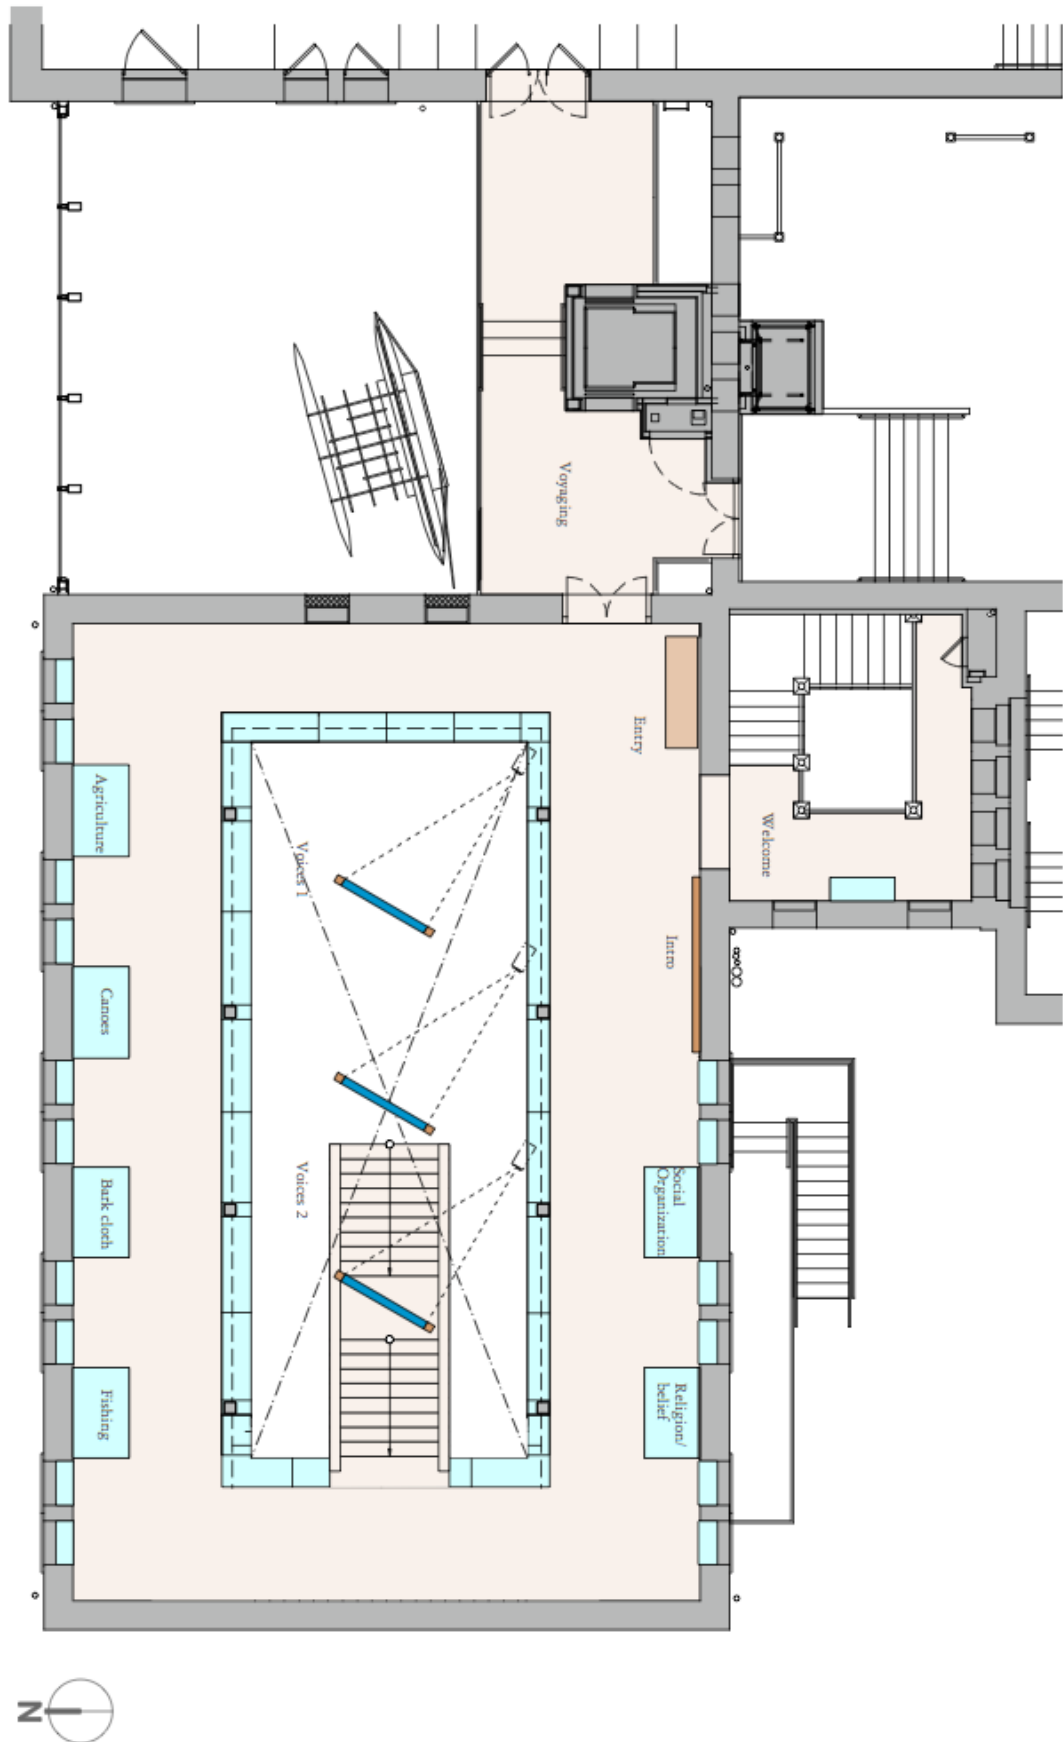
Floor plan PH2, BPBM. 31 March 2010
